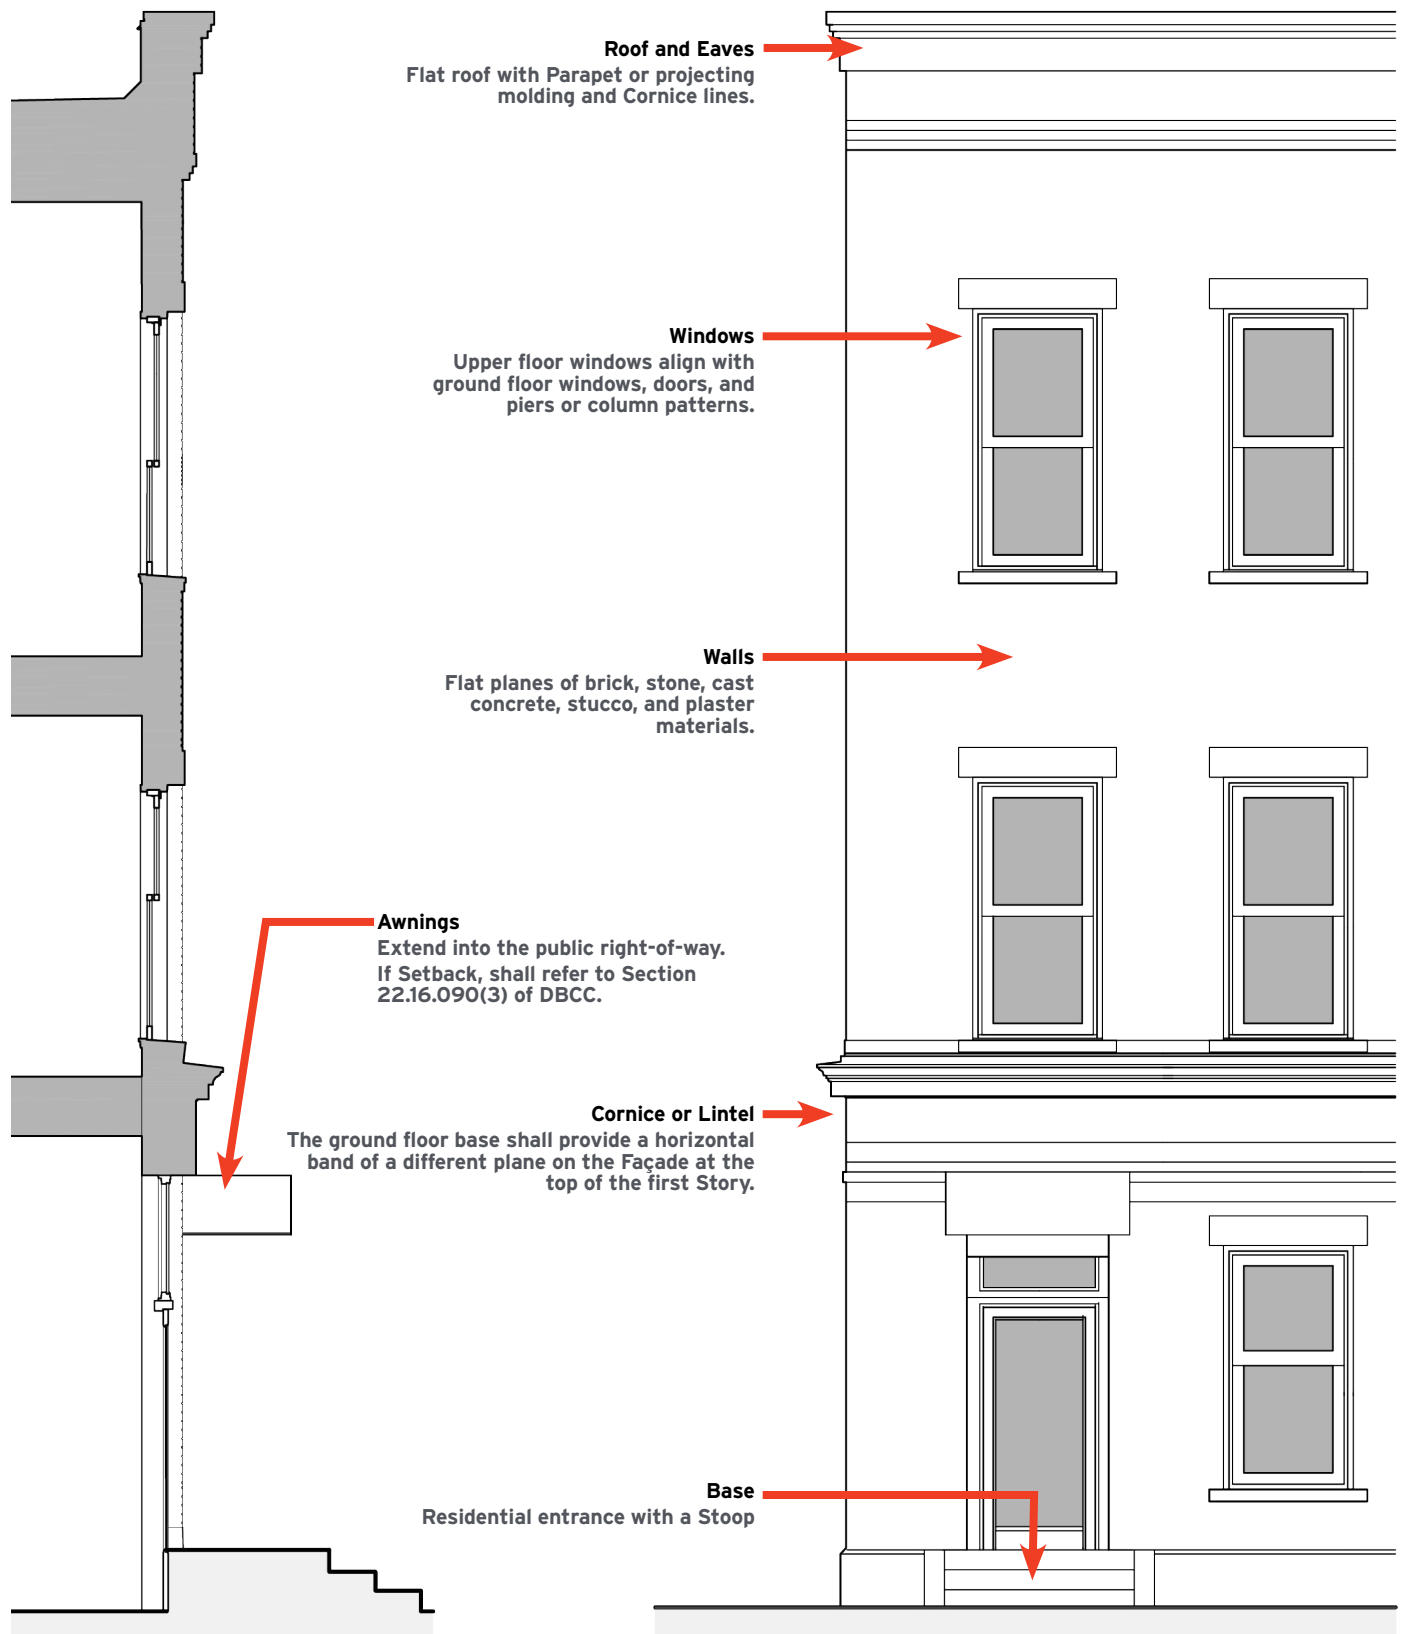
Main Street Commercial Elements Diagram (Ground Floor Residential)
